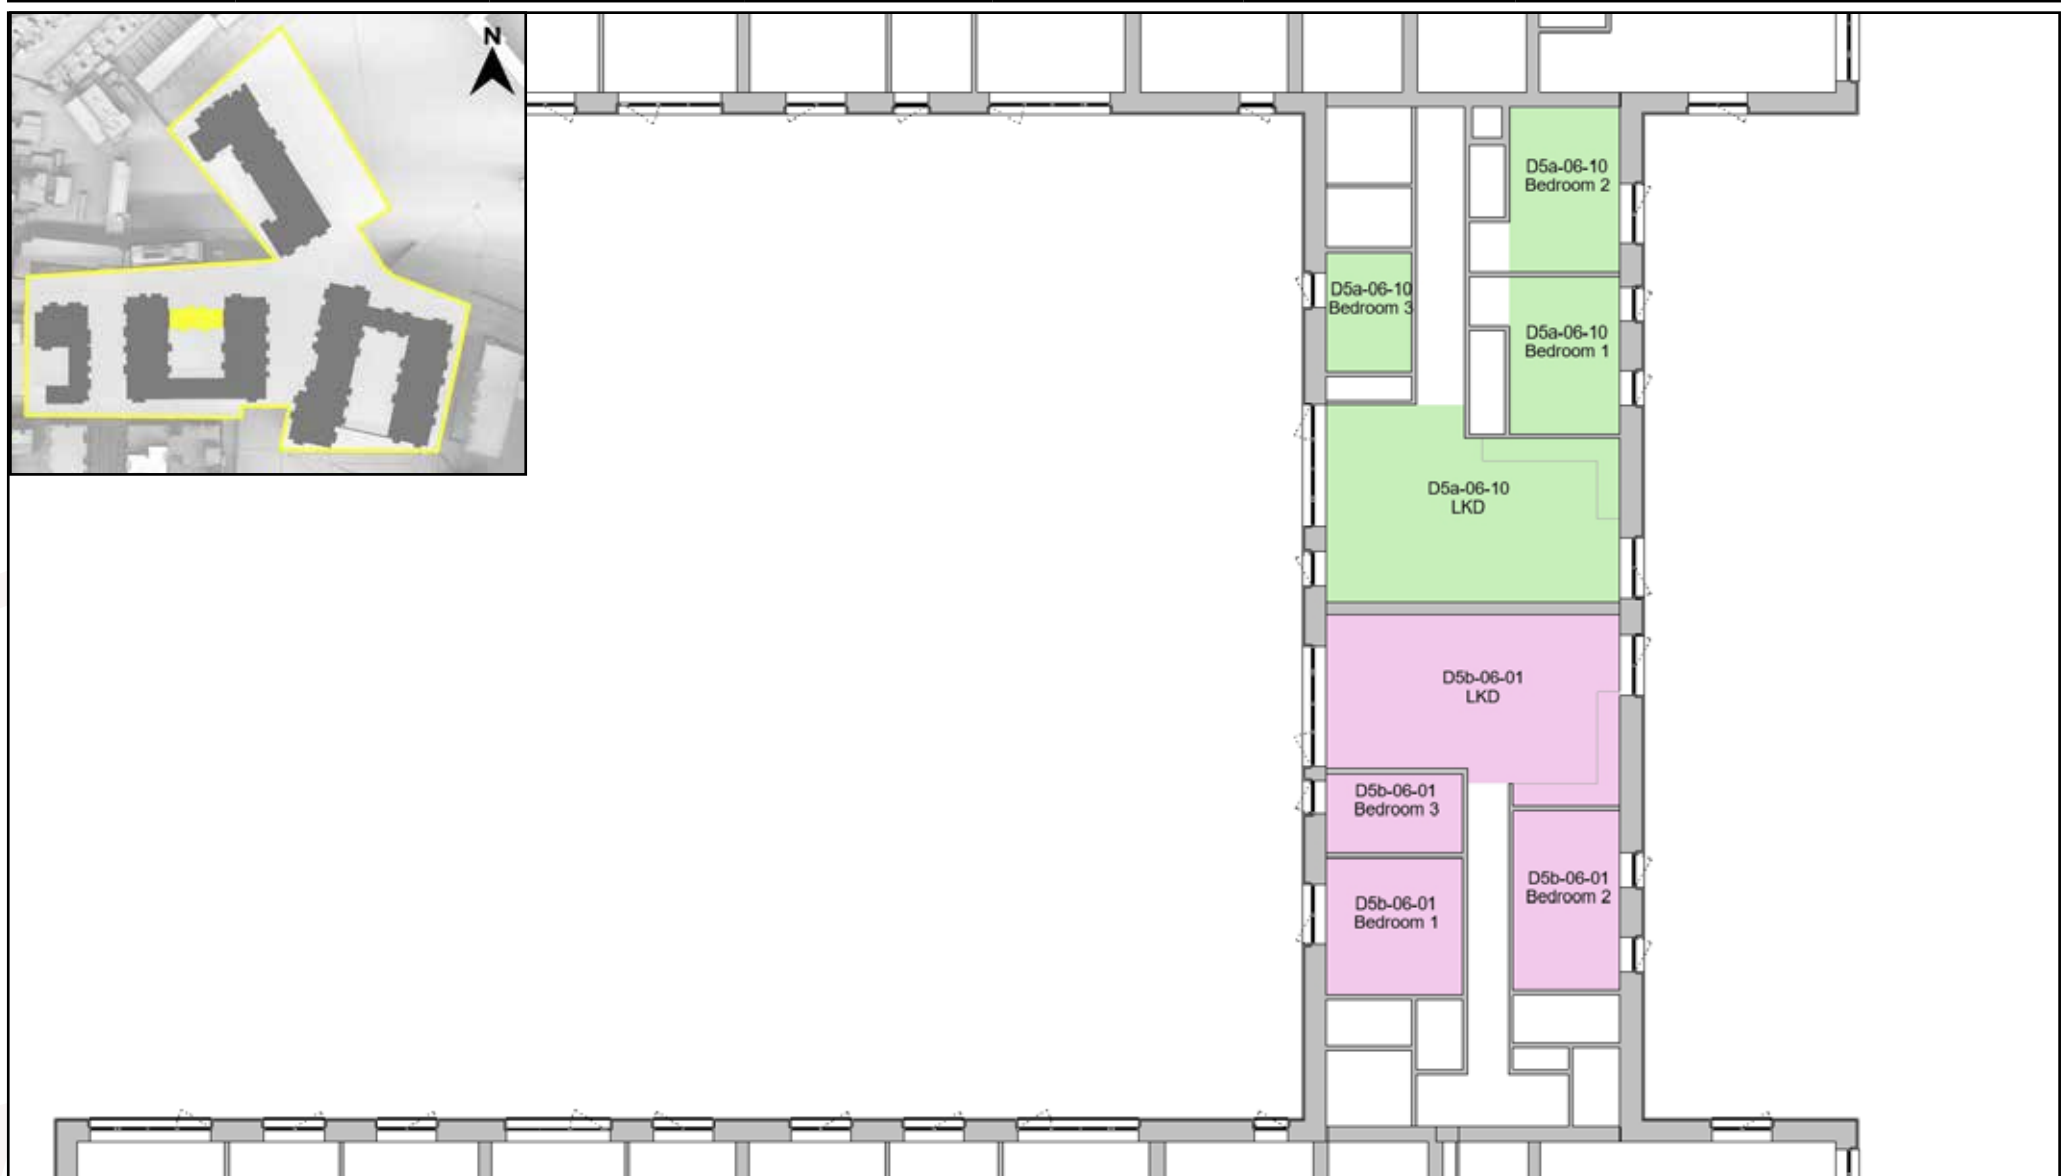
Floor plan of assessed building (R), Keyplan highlighting the assessed building (L).
